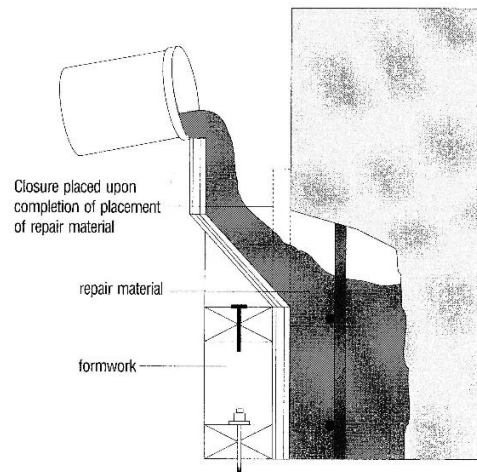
Concreting process of areas with problems of concrete spalling(Kamran, 2006)
